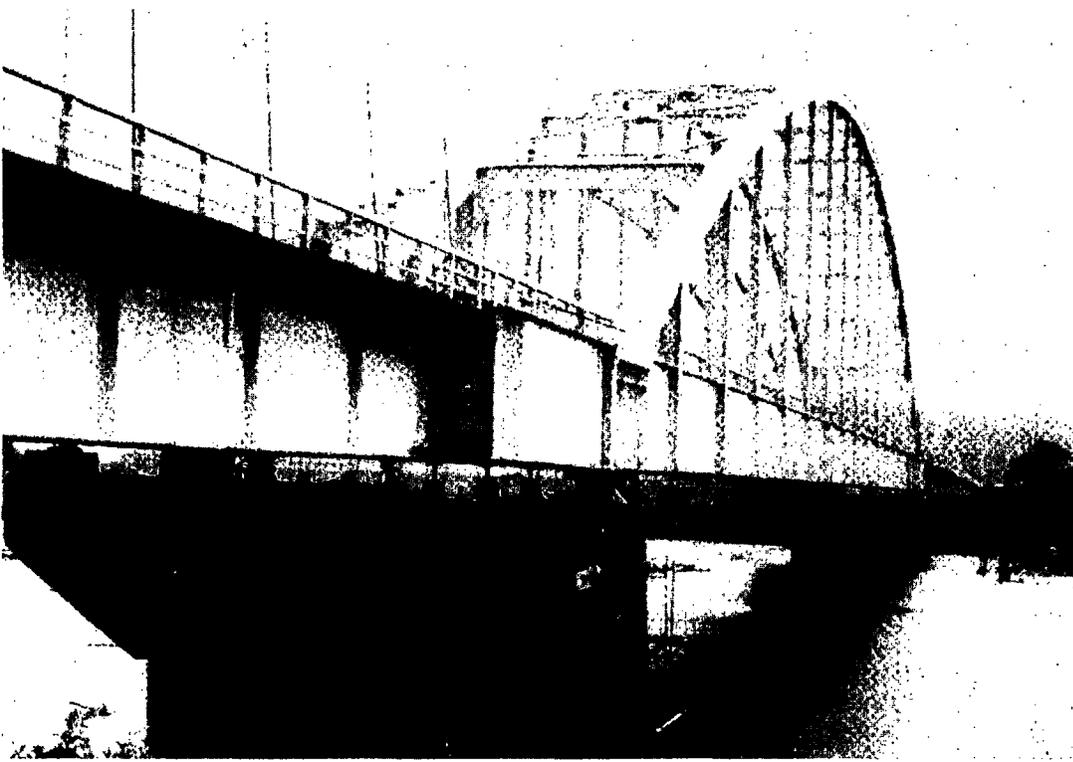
The main tied arch span of the Tenno Bridge with the cracked wall pier in the foreground. Note the smaller, pedestrian bridge in the background.
